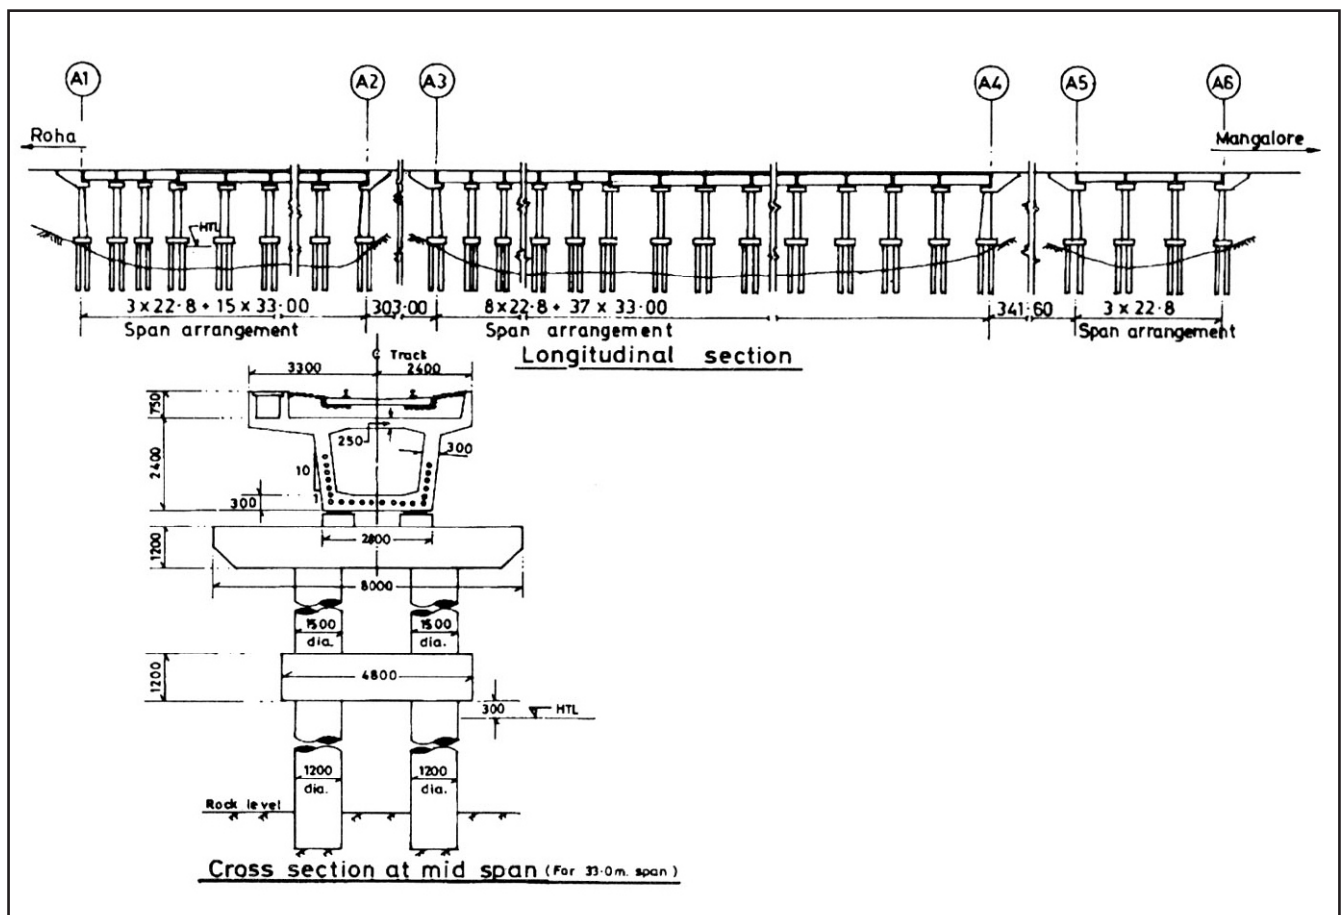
Longitudinal and cross sections of the bridge across river Sharavathy
